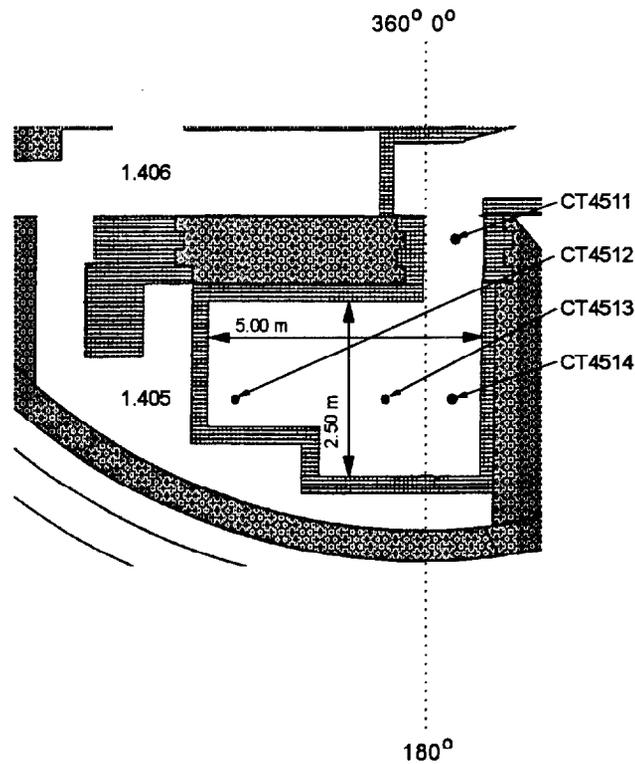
Fire Room at the -0.7 m Elevation for T51.1
